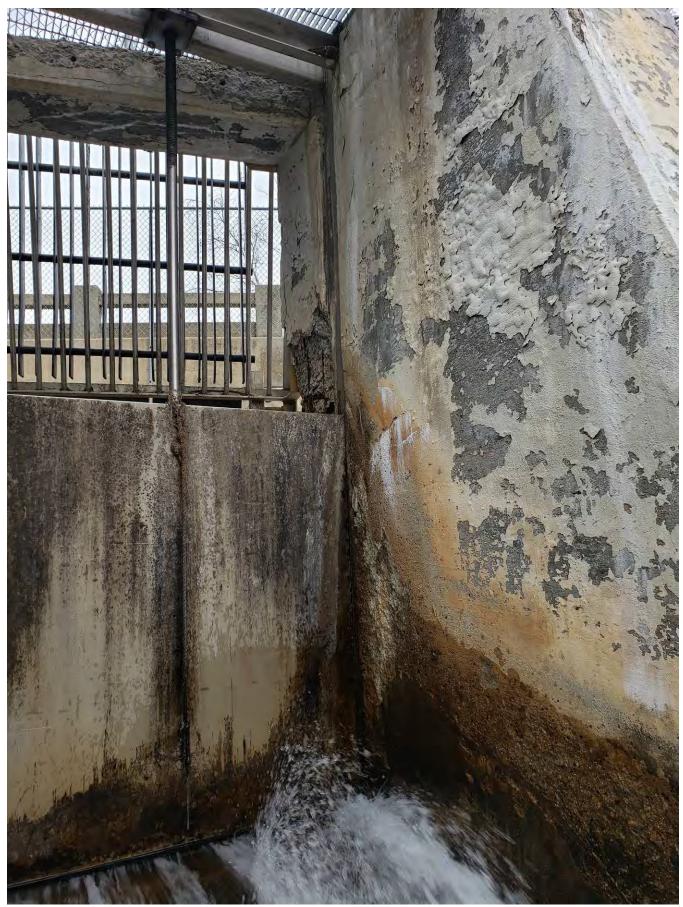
EXPOSED REINFORCING STEEL IN LEFT SLUICEWAY WALL.
